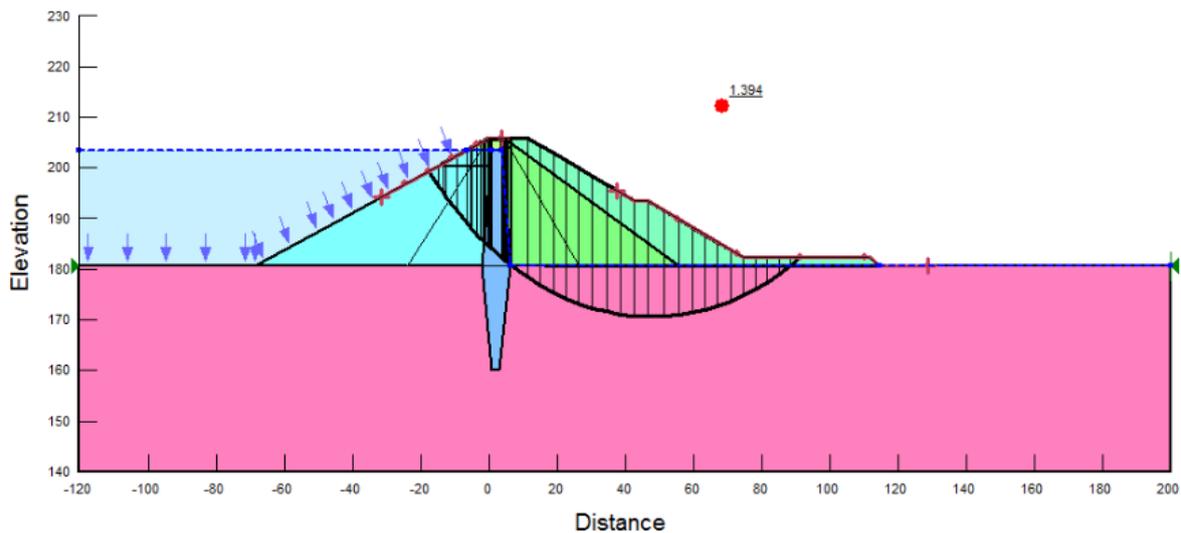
Critical failure slope for "Weak" Foundation
